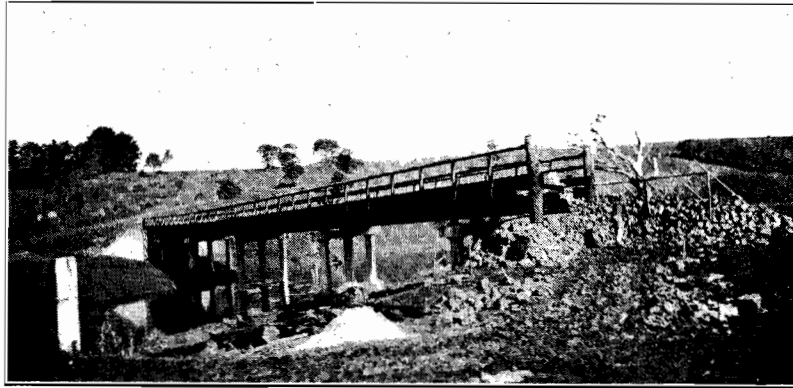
Showing bridge erected over the Mount Emu Creek on the Garvoc-Laang Road in the Shire of Warrnambool.
